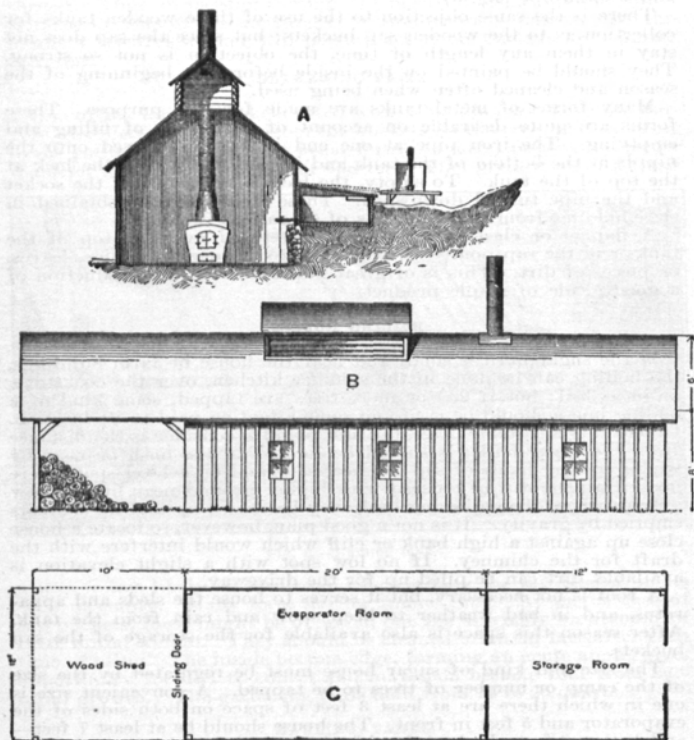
Plan of a model evaporation house: A. Sectional view, showing evaporator, storage tank, and gathering tank (on shed). B. Elevation. C. Ground plan.
